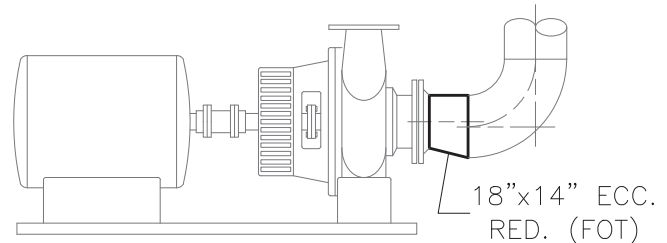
Eccentric reducer on pump suction nozzle.
